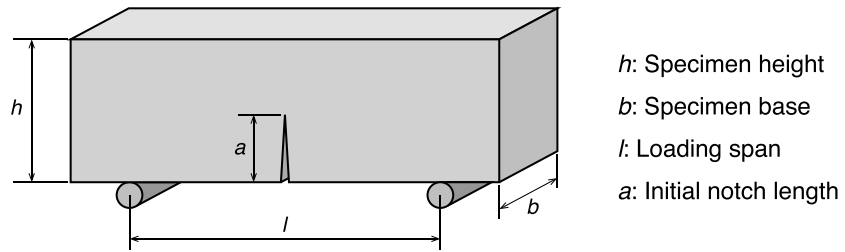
Schematic illustration for specimen dimension of three-point bending (mode-I loading) tests.
